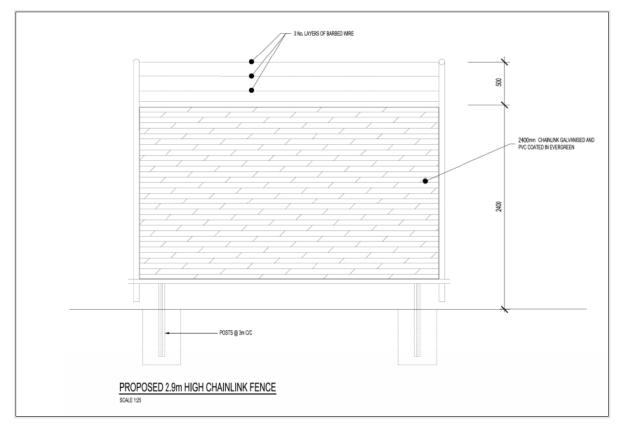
Proposed 2.9 m Outer Perimeter Fence
